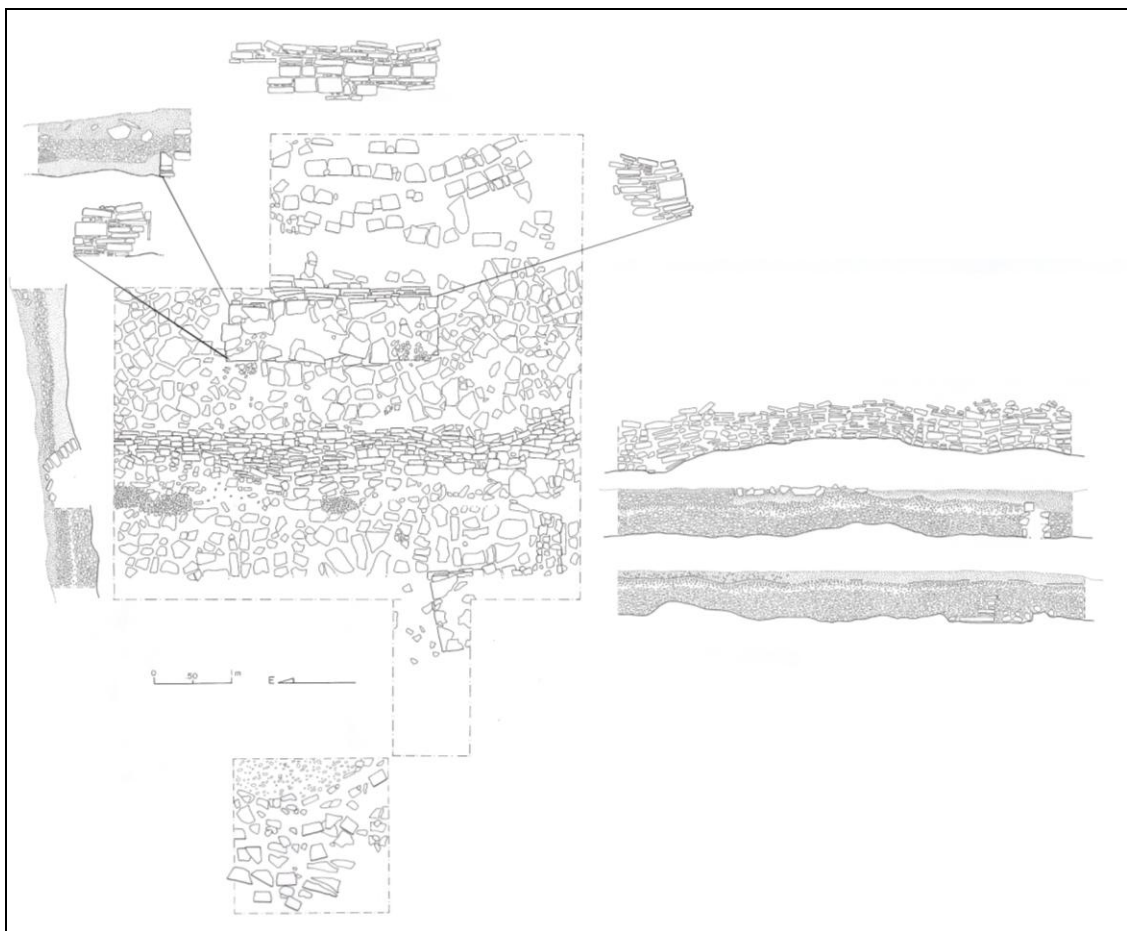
Location of different profiles and elevations of Structure L7-14-Sub-1 architectural details
